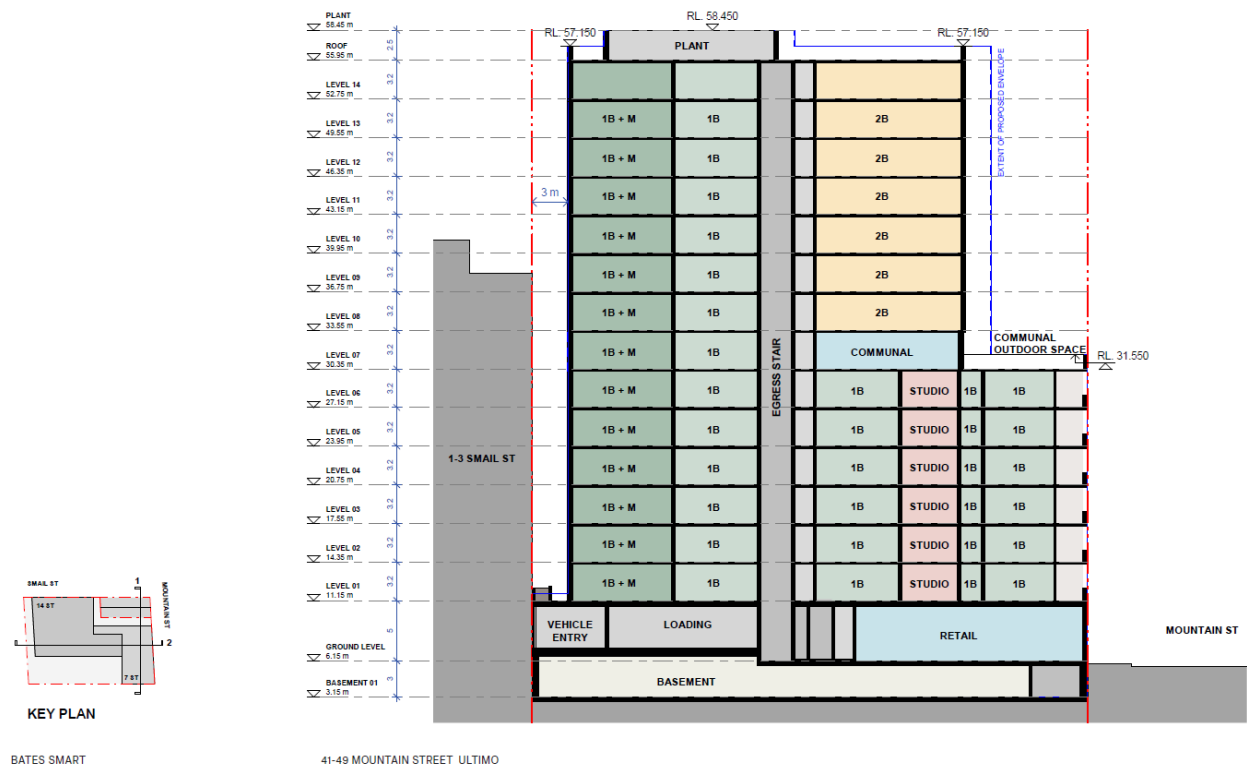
Extract of concept plan showing section 2 facing towards Smail Street site frontage.
